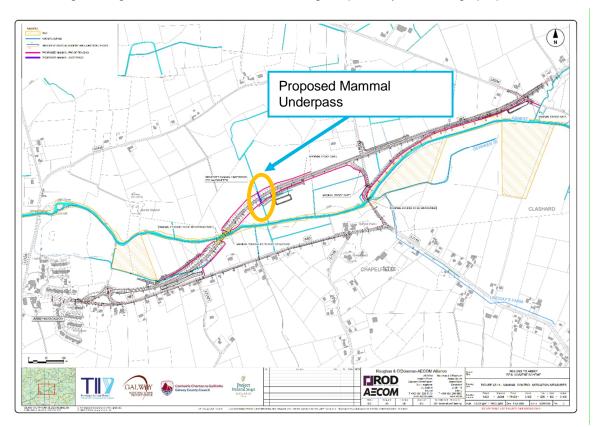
Proposed Mammal Underpass Location (Figure A7.11 of the EIAR)
